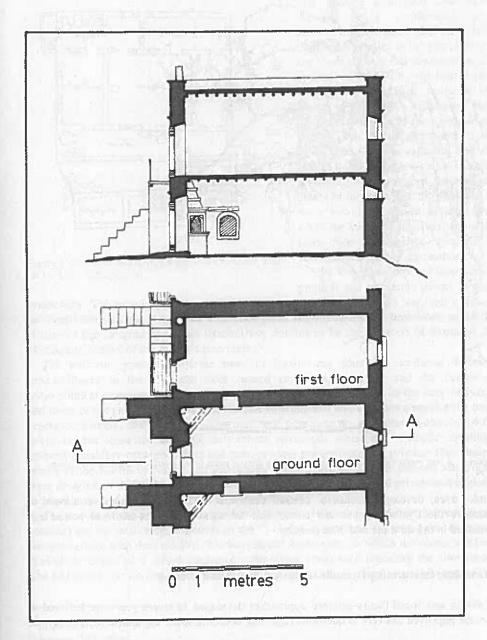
Section and plan of a typical late medieval two-storey single-roomed Cycladic house in the defended settlement of Kimolos (after Sanders, 1996, fig. 20)
